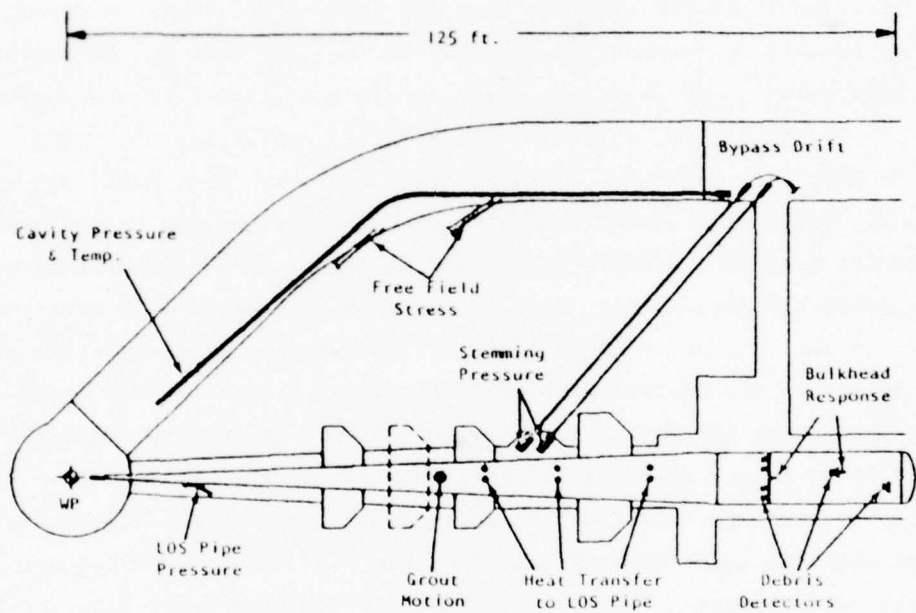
Plan view of Hybla Fair showing location of gages. (SSS-R-75-2631)
